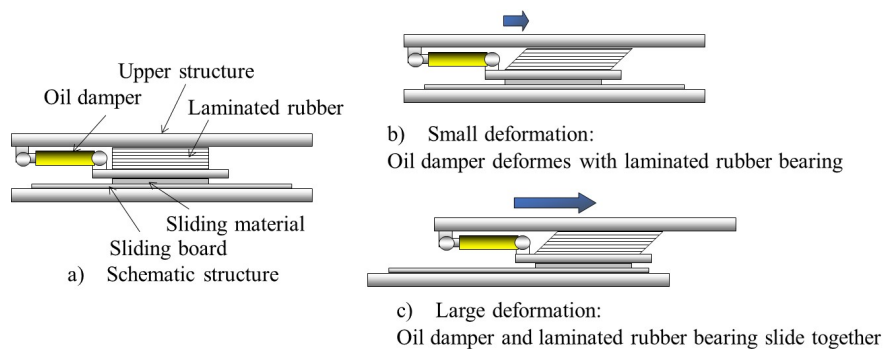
Mechanism of elastic sliding bearing with oil damper
